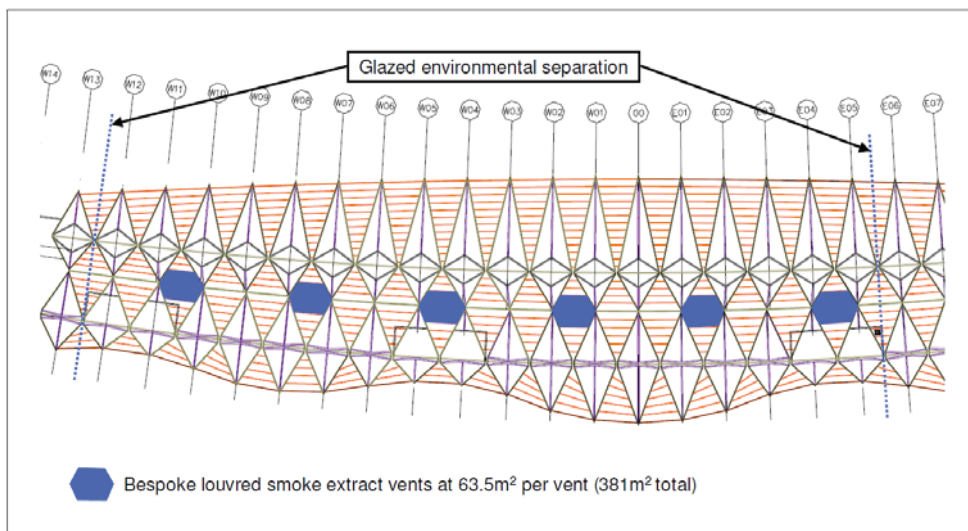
Roof plan - showing layout of vents at natural high points in roof
